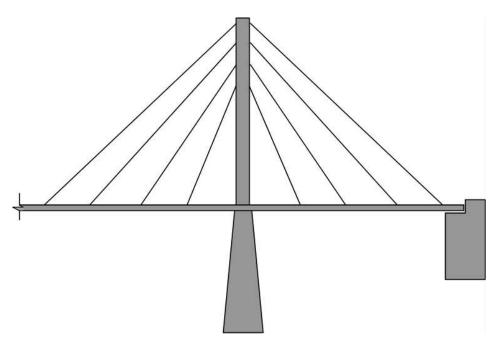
Fan or Intermediate Cable System Schematic
